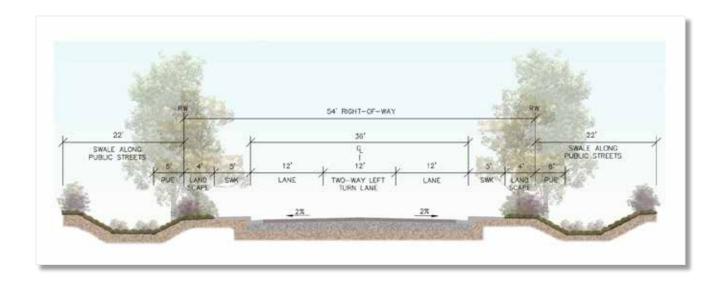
Internal Backbone Street Street "A" (Morgan Street) south of Dayton Street (no parking allowed) Modified 4/1/2024
